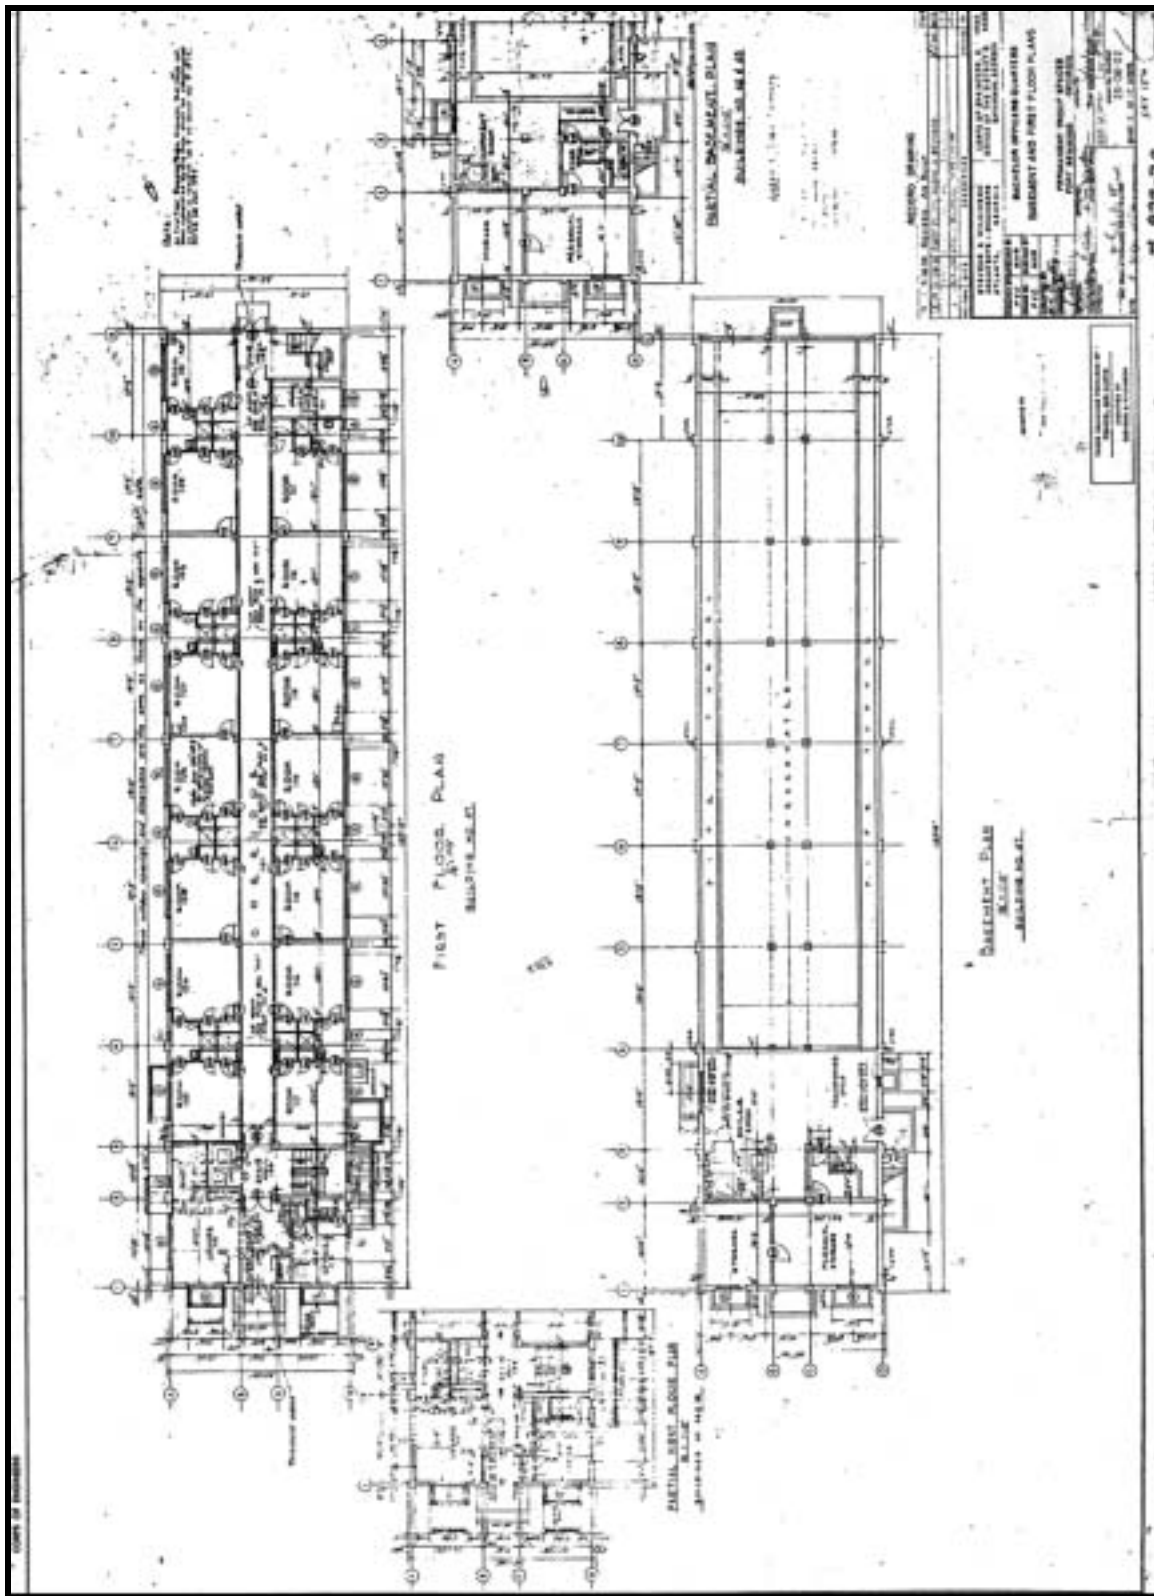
Two-story, hammerhead BOQ, basement and first floor plans, Ft. Benning (1952, revised 1953) (Engineering, Ft. Benning).
